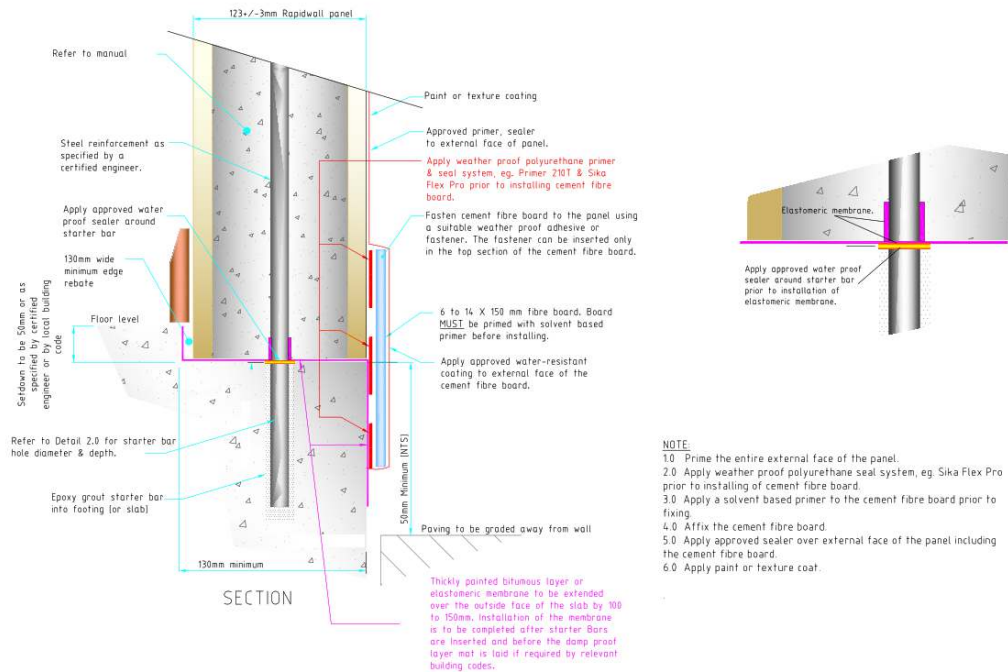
Concrete filled Rapidwall External wall to footing connection option 2 of 3
